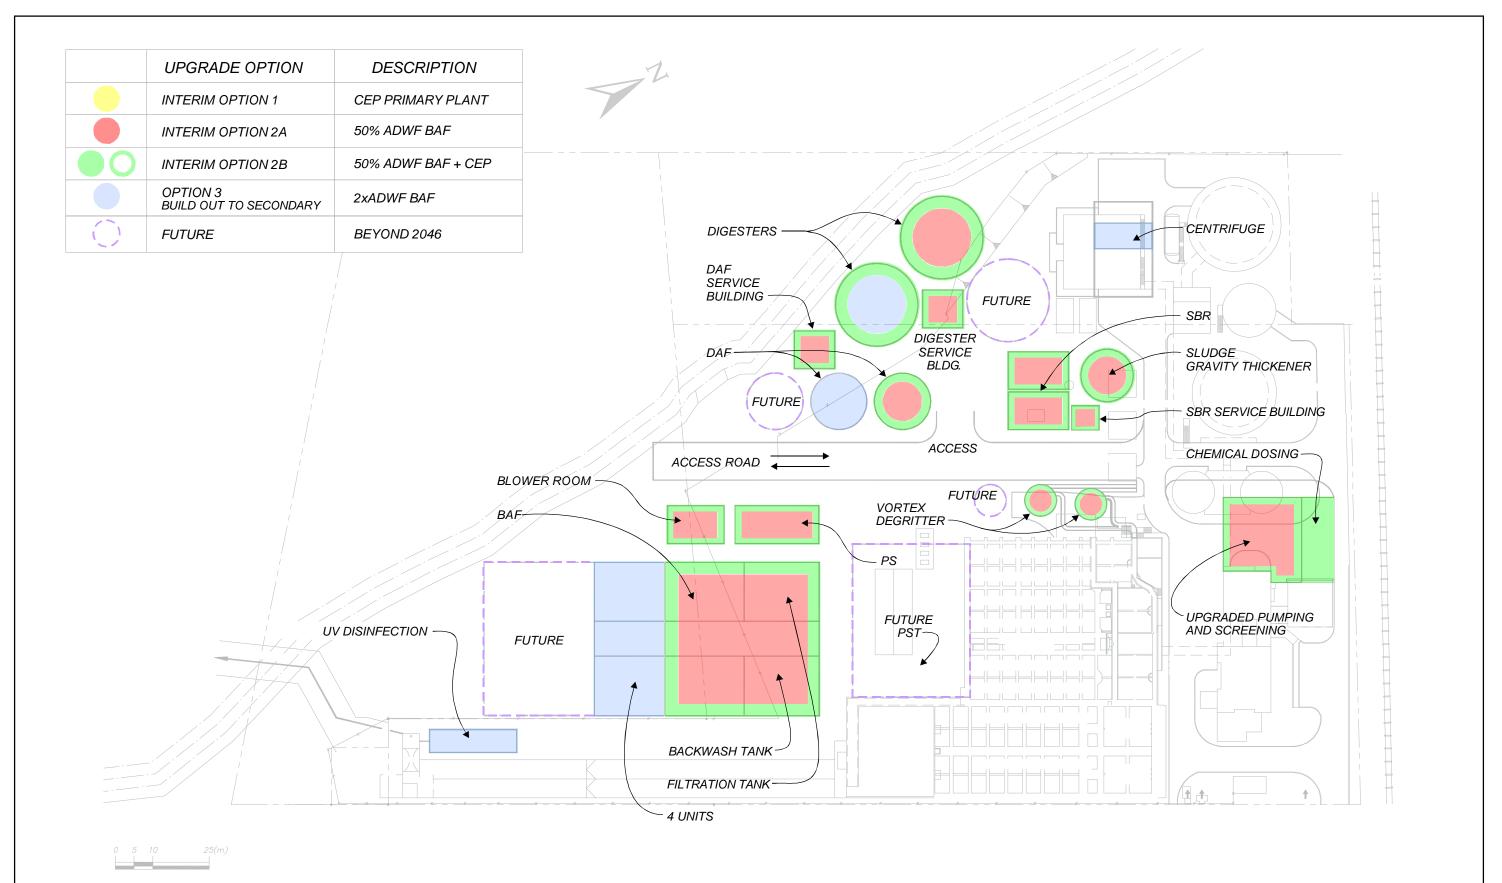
LGWWTP PROPOSED PLANT LAYOUT AND STAGING PARTIAL BIOLOGICAL TREATMENT TIL 2031
